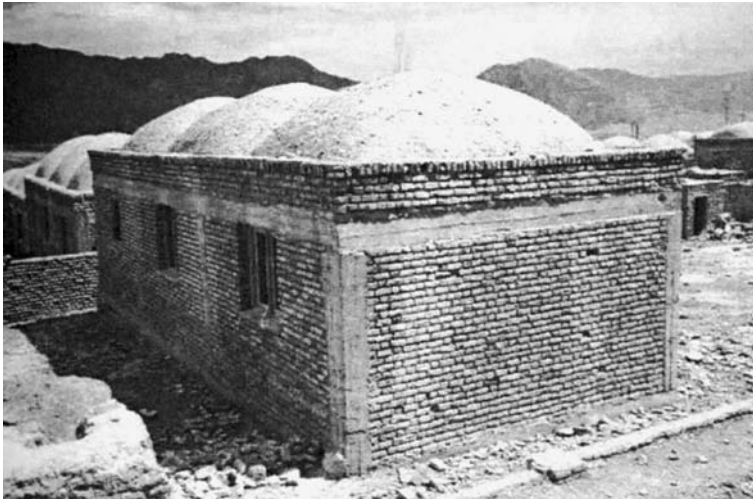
Adobe construction with ring reinforced concrete ringbeam. These houses, built following the Gholbaf earthquake in Kerman Province in 1981, were again shaken by a powerful earthquake in 1998, but none suffered major damage (source: [Maheri et al. 2006](#), Reproduced by permission of Earthquake Engineering Research Institute)
